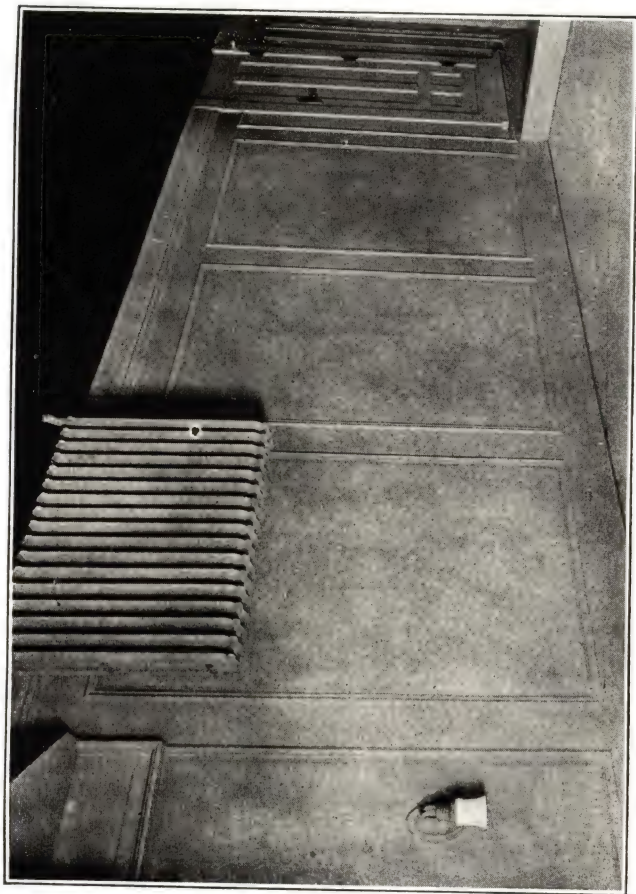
An Attractive Layout of Panel Mouldings in a Bedroom.
